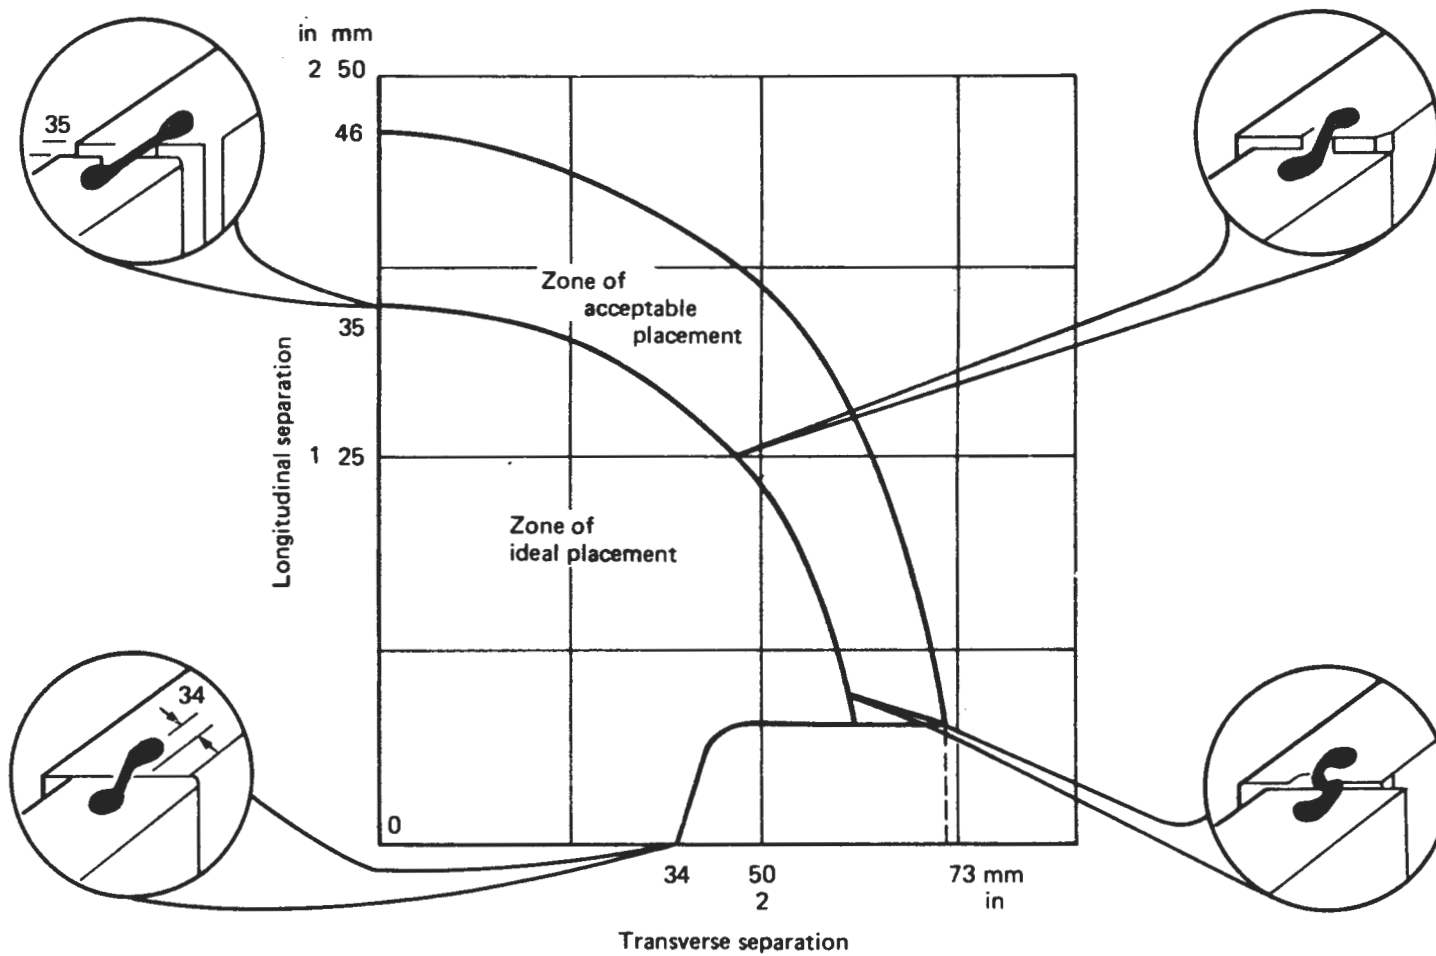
Tolerances for Separations between Precast Panels with Waterstop Joints
